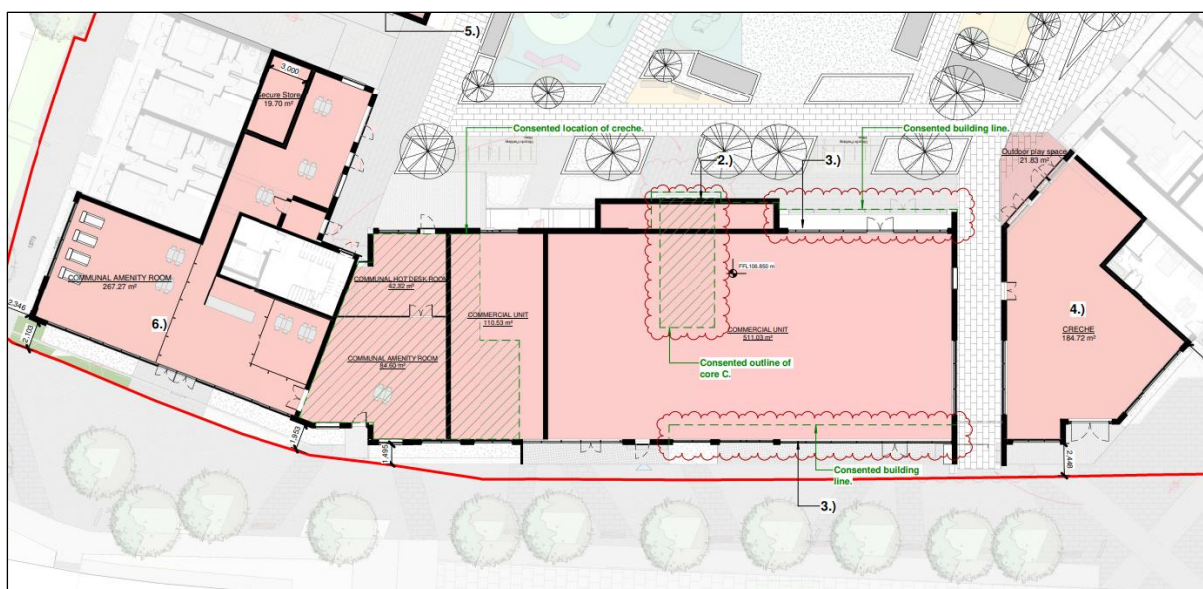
Excerpt from ground floor plan of development proposed under S146B amendment
